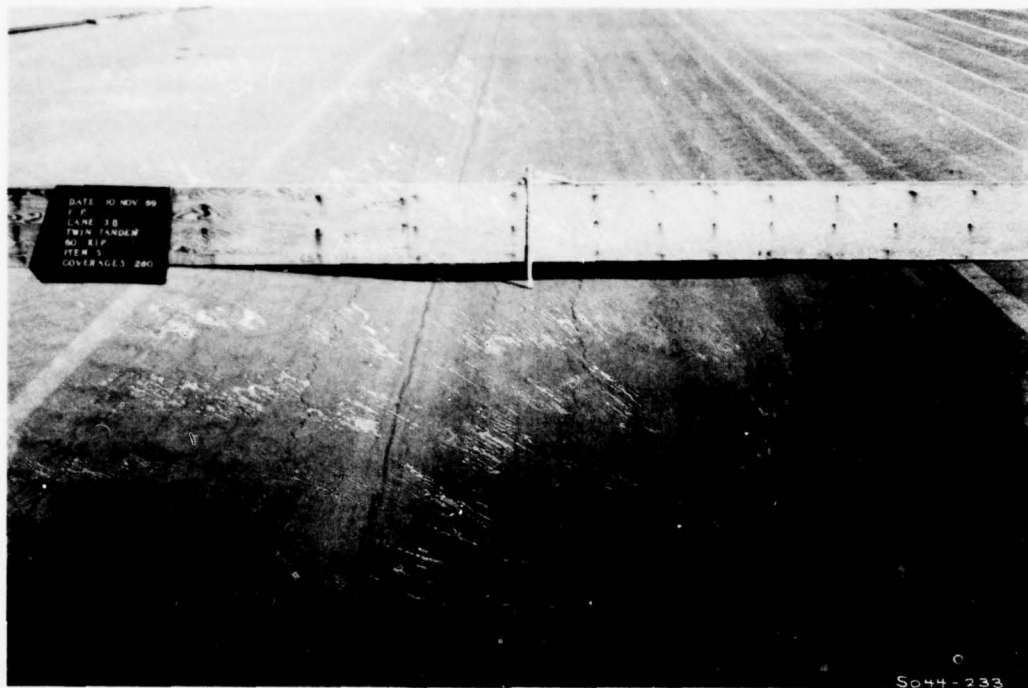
MEASUREMENT OF RUT DEPTHS ON PROTOTYPE TEST SECTION
